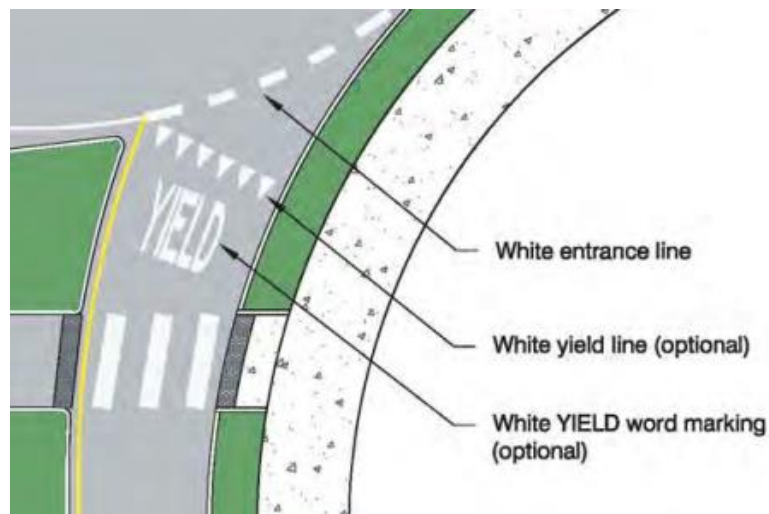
Sample intersection layout (Rodegerdts et al., 2010).
